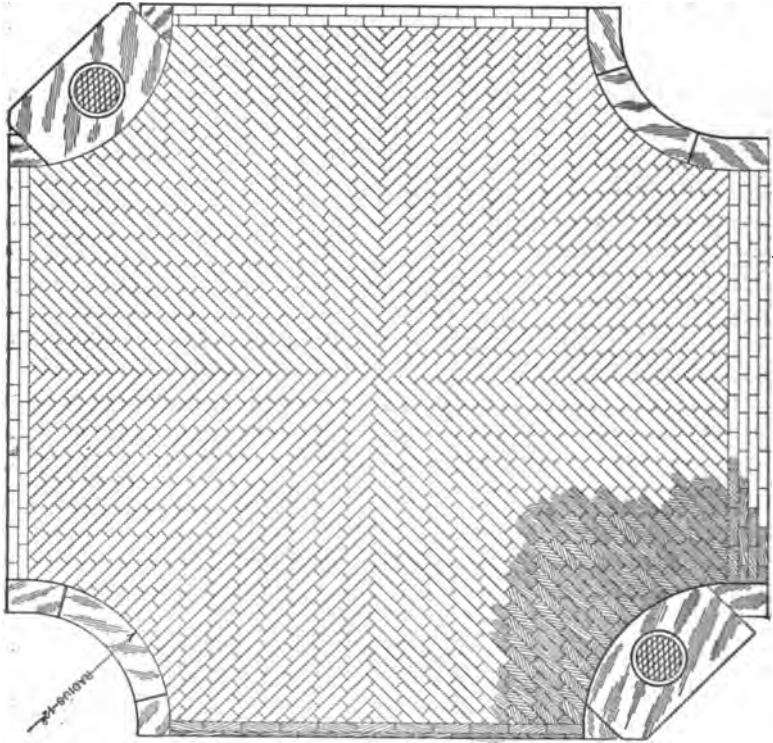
A.—PLAN OF BRICK PAVING AT STREET INTERSECTIONS. 30 feet of the pavement is laid, every part of it should be rammed with a rammer weighing not less than 50 pounds, and the bricks which sink below the general level should be removed and replaced by a brick of greater depth. After the ramming and rectification Portland-cement grout should be poured into the joints until it appears on the surface ; then the whole surface should be covered with a layer of dry sand one-half inch deep. At street-intersec-
